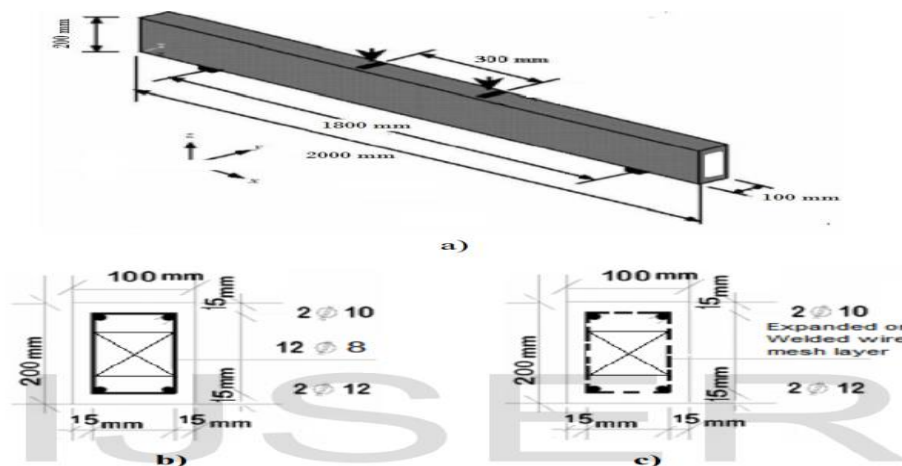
a) Beams geometrical shape and reinforcement details, b) control specimen; c) sample of beam with expanded or welded layer mesh [10]
